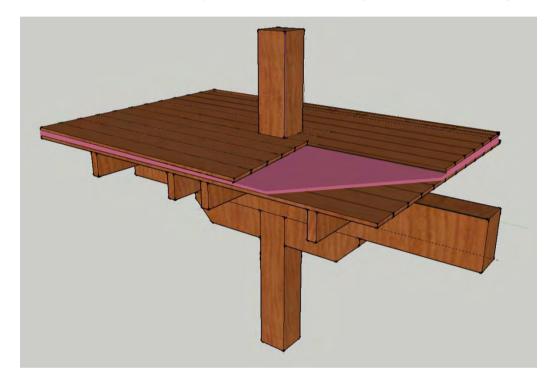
Diagrammatic detail showing preservation of existing floor boards, introduction of fire resistant and acoustic material and installation of new floor boards above. NBRS+Partners, 2015.
